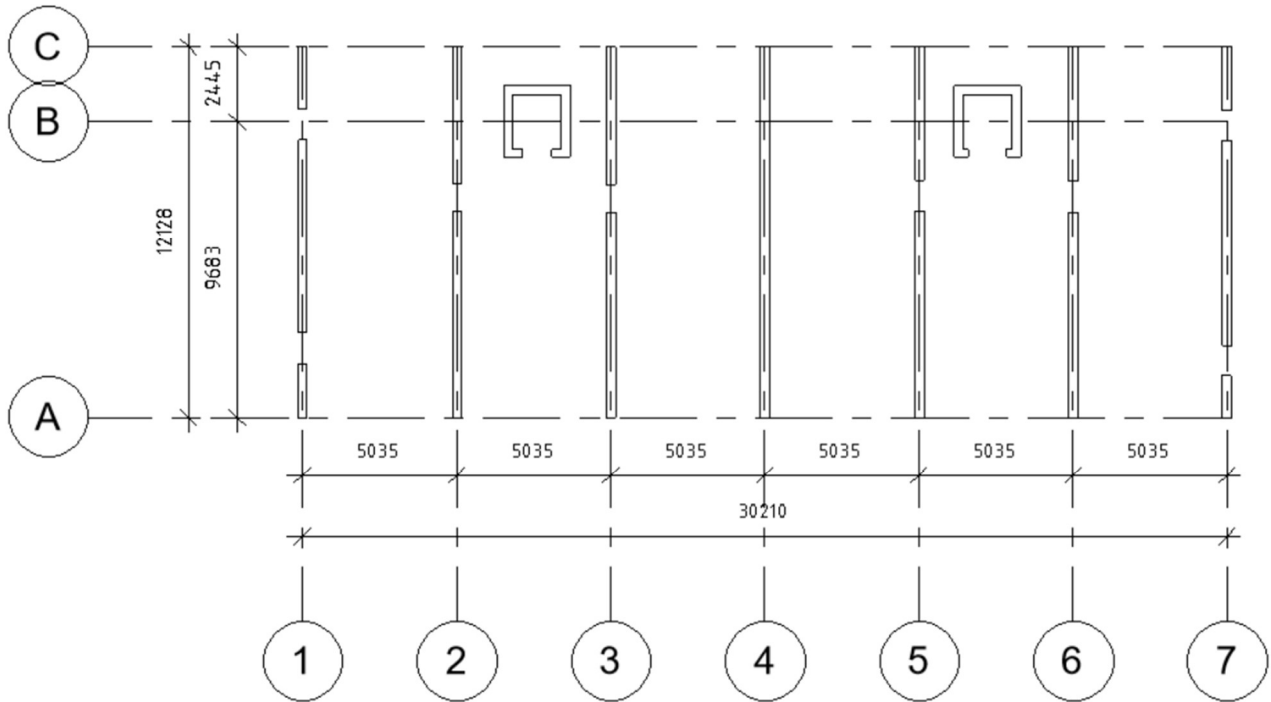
Plan of load-bearing RC walls (unit: *mm*).
